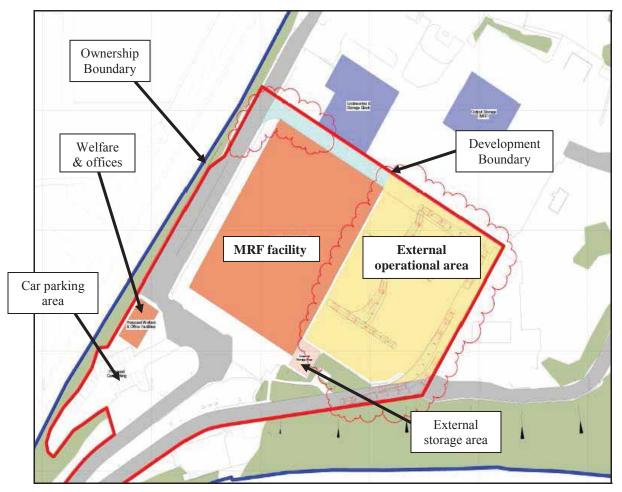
Proposed Site Plan (from M+W Group, Drawing 2001 Revision E)
